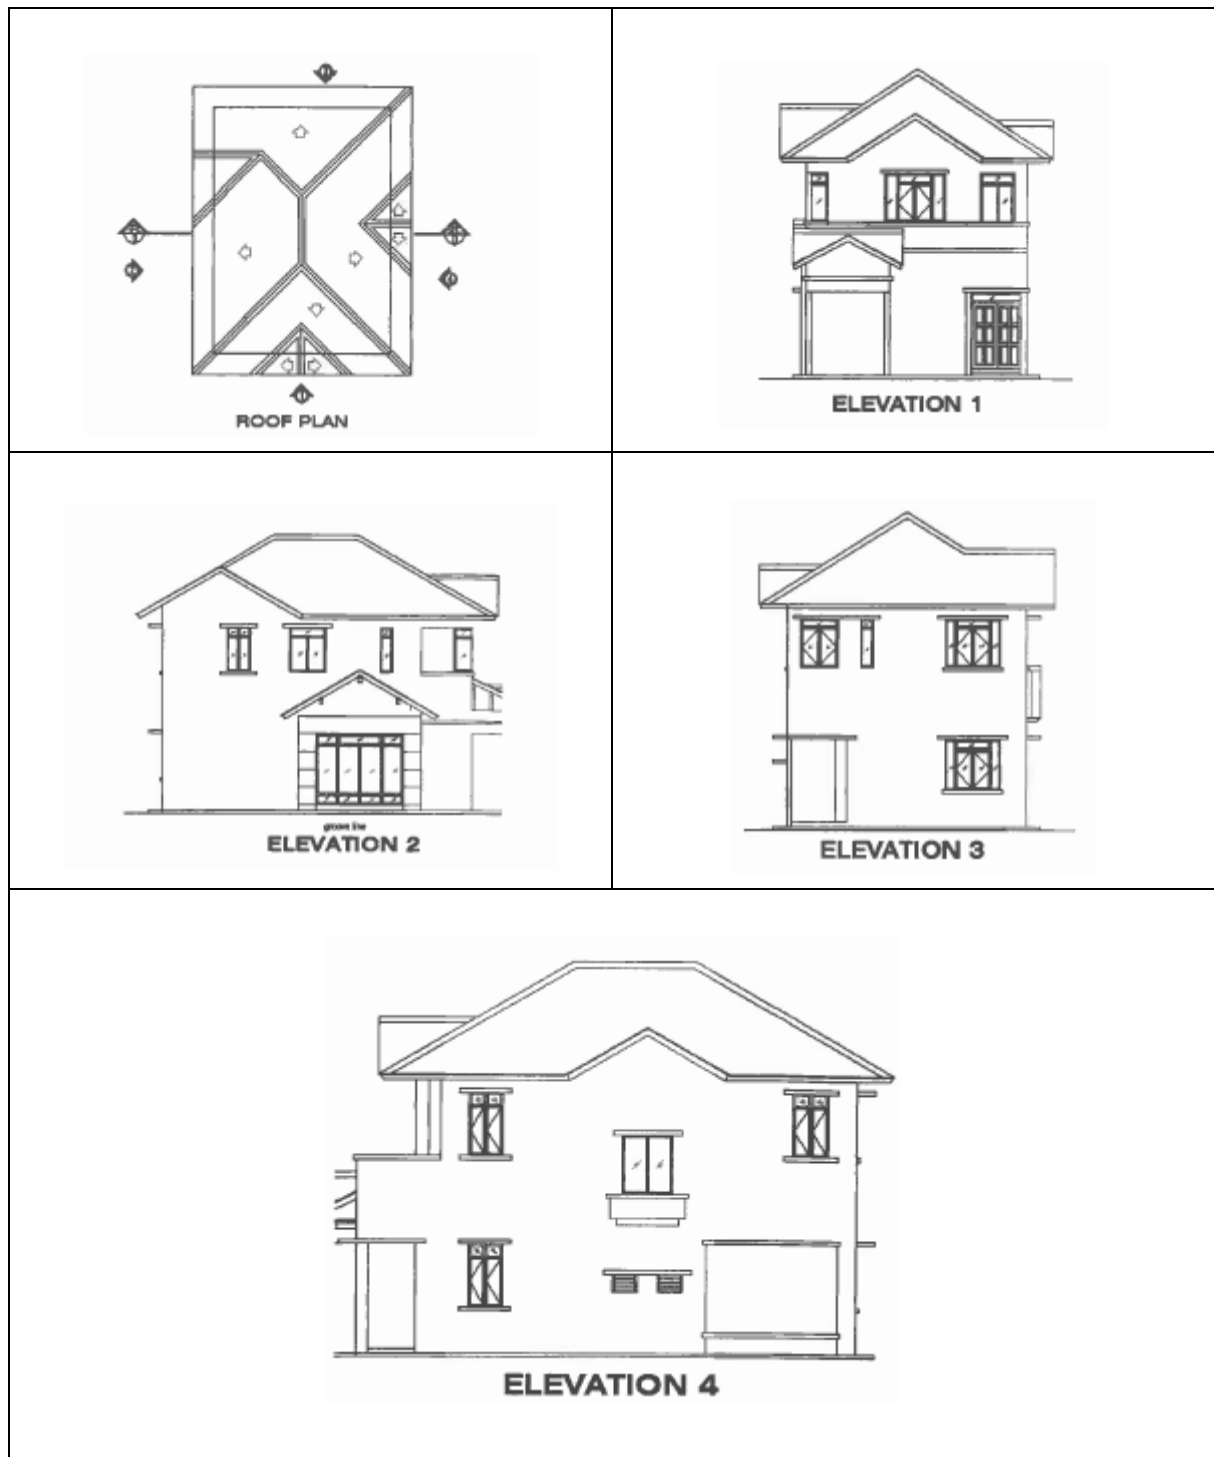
Completed layout of double storey house, the floor plans and elevation of the building
